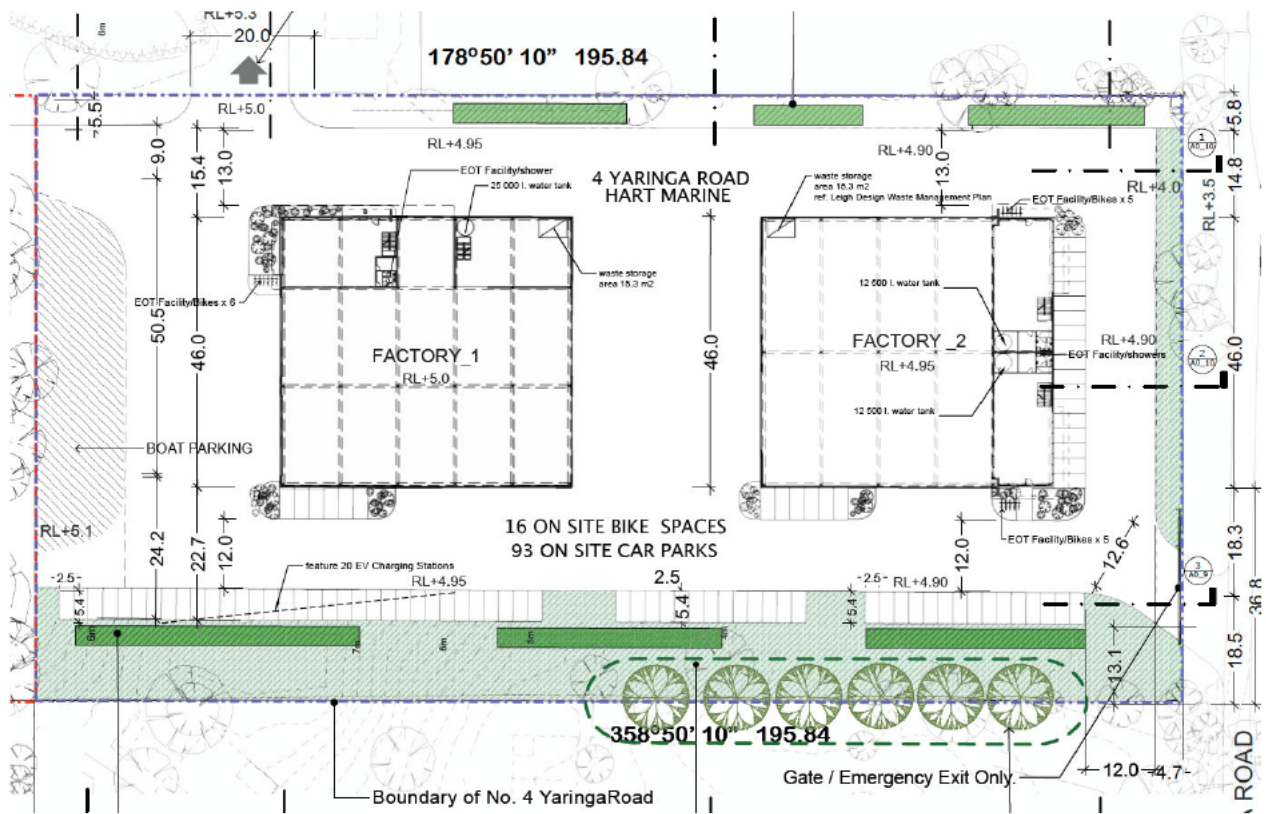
Proposed factories to be constructed at 4 Yaringa Road
